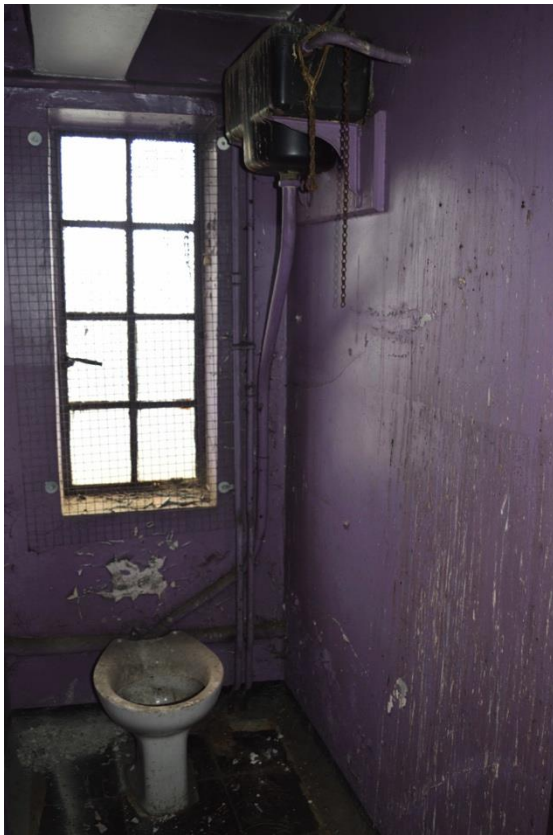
Third floor, southern wing, female WC, cubicle and fitting detail, facing south (7533_0082)
